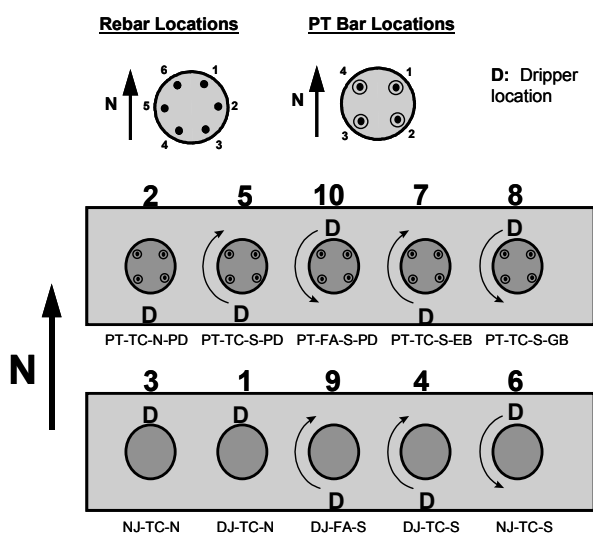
Specimen Location Specimen Details. ^{5.1}
